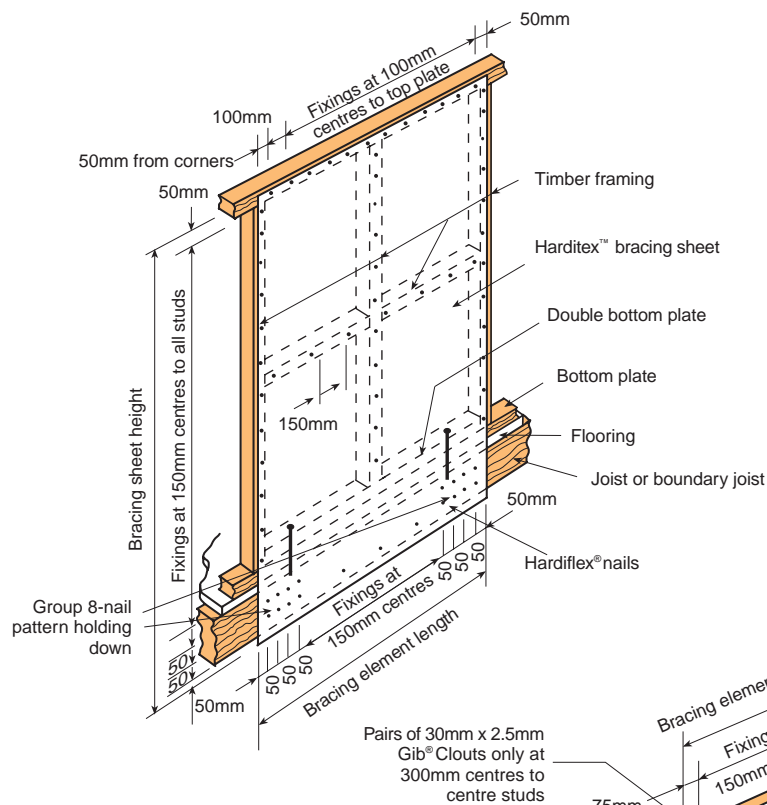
DETAIL WHEN BRACING SHEET STOPPED BELOW TOP PLATE
